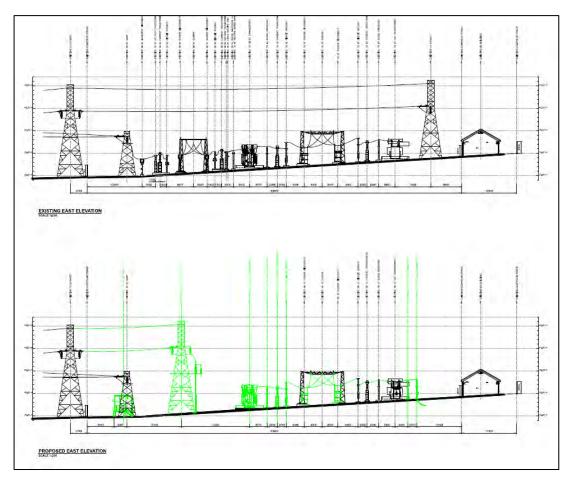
Site Elevations: Existing and Proposed (Drawing No. PE492-D056-104-007-000)
